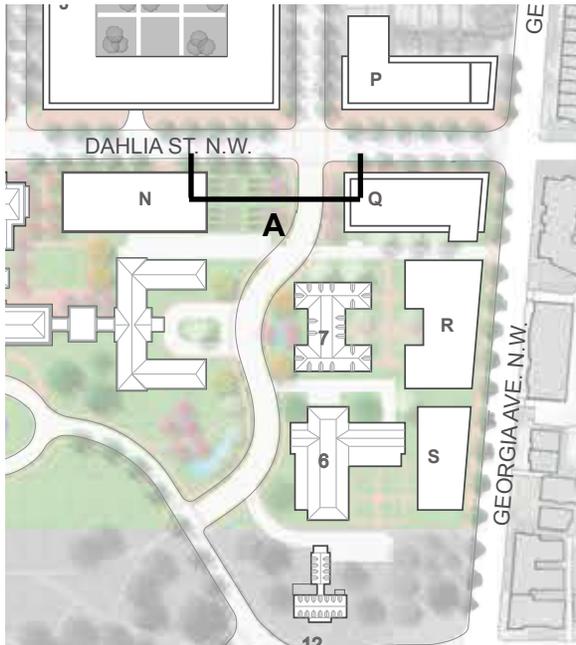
Street Sections Key Plan - Institutional Core. Source: Perkins+Will
